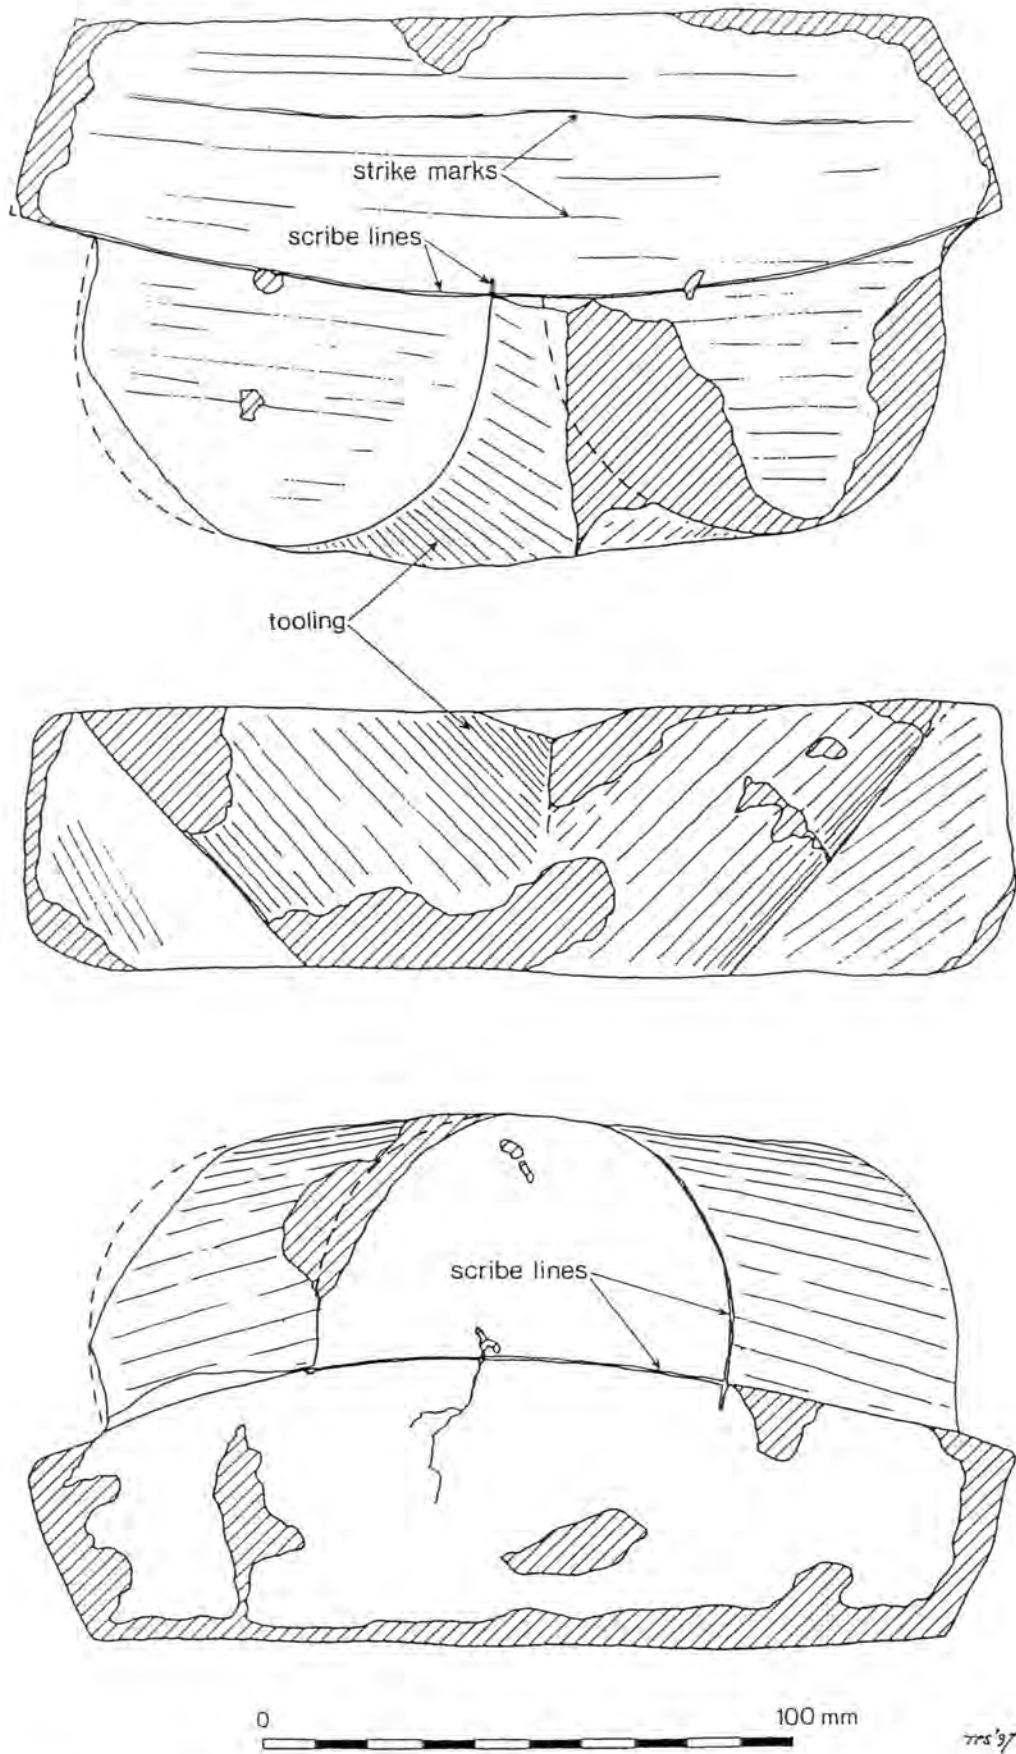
The early Tudor chimney brick from Bridewell Palace, London
